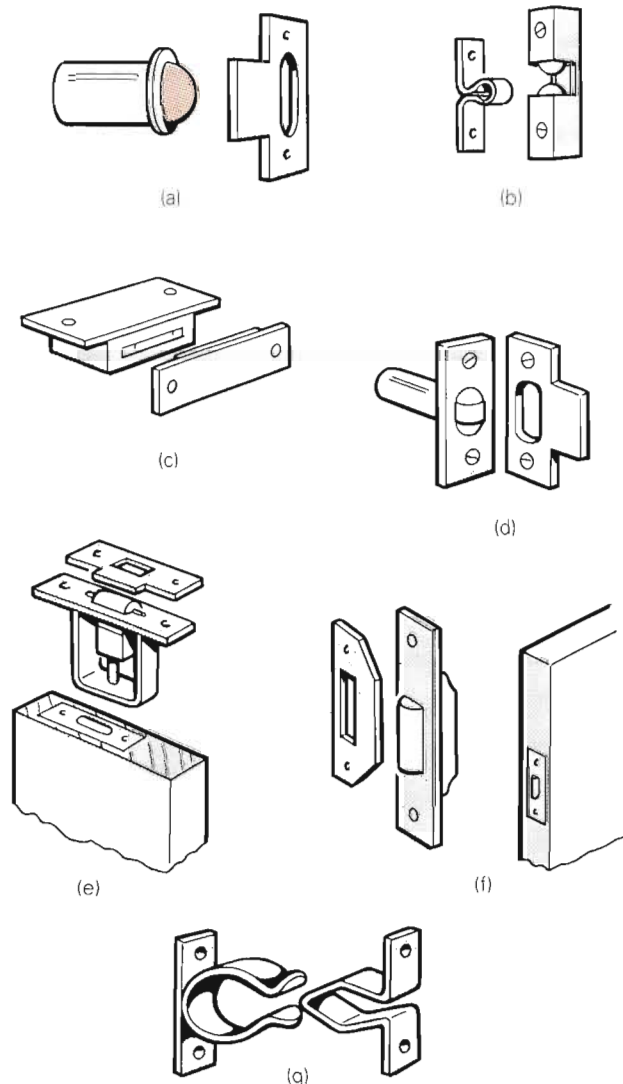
Types of catch: (a) ball, (b) double ball, (c) magnetic, (d) roller mortise, (e) French, (f) spring, (g) surface cupboard catch.
